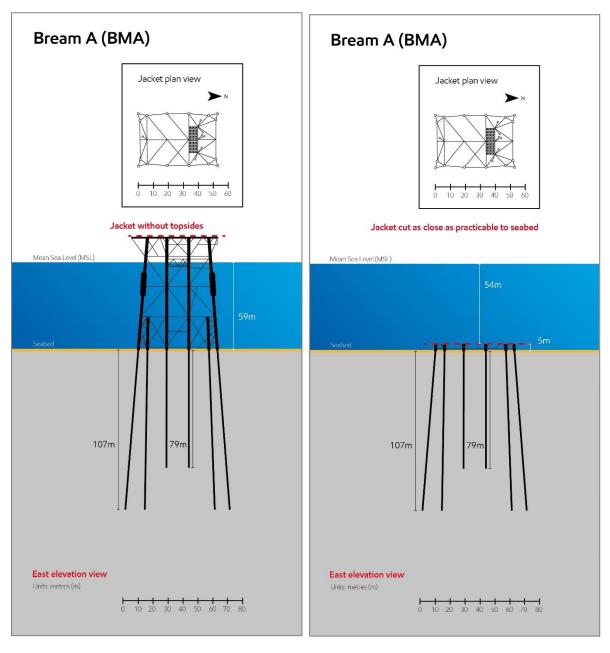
Bream A Steel Piled Jacket without topsides (left) and under proposed end state (right)
